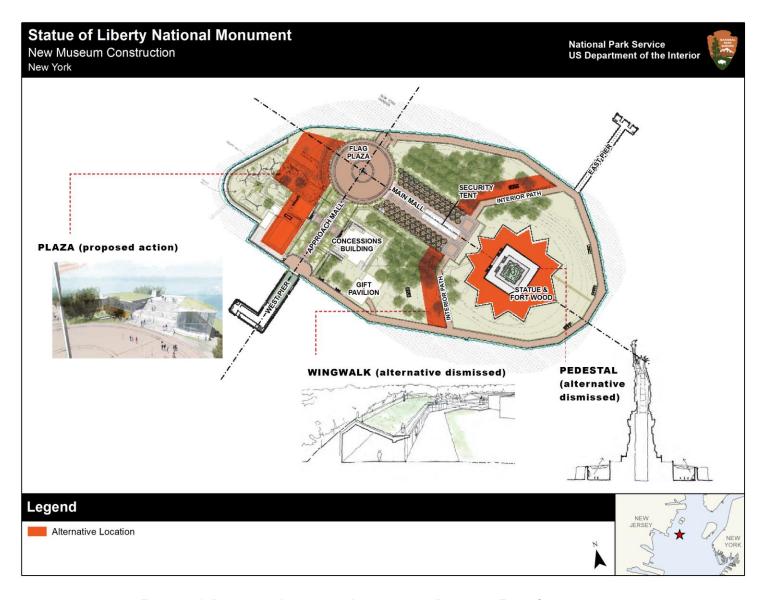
PROPOSED ACTION AND ALTERNATIVES DISMISSED FROM CONSIDERATION
